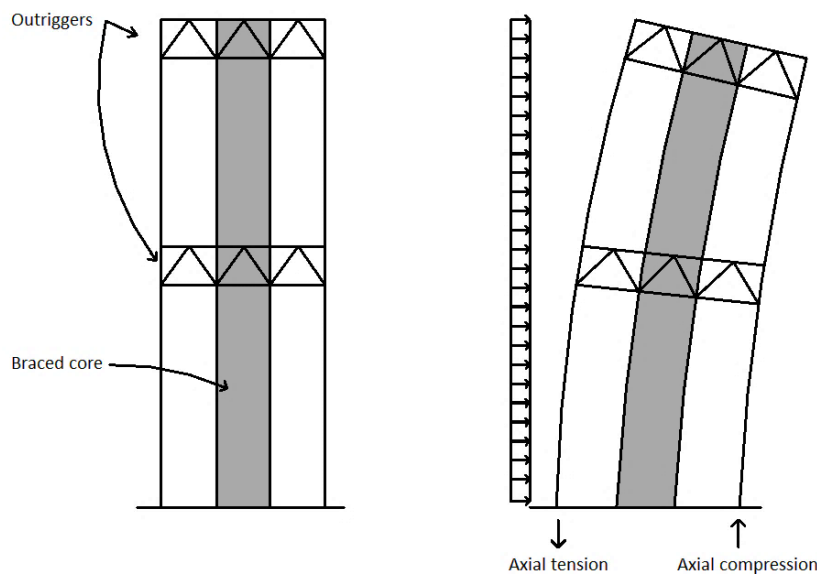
Core structure with centric core and two outriggers subjected to lateral load. The outriggers impose tension and compression on the windward and leeward side respectively.
